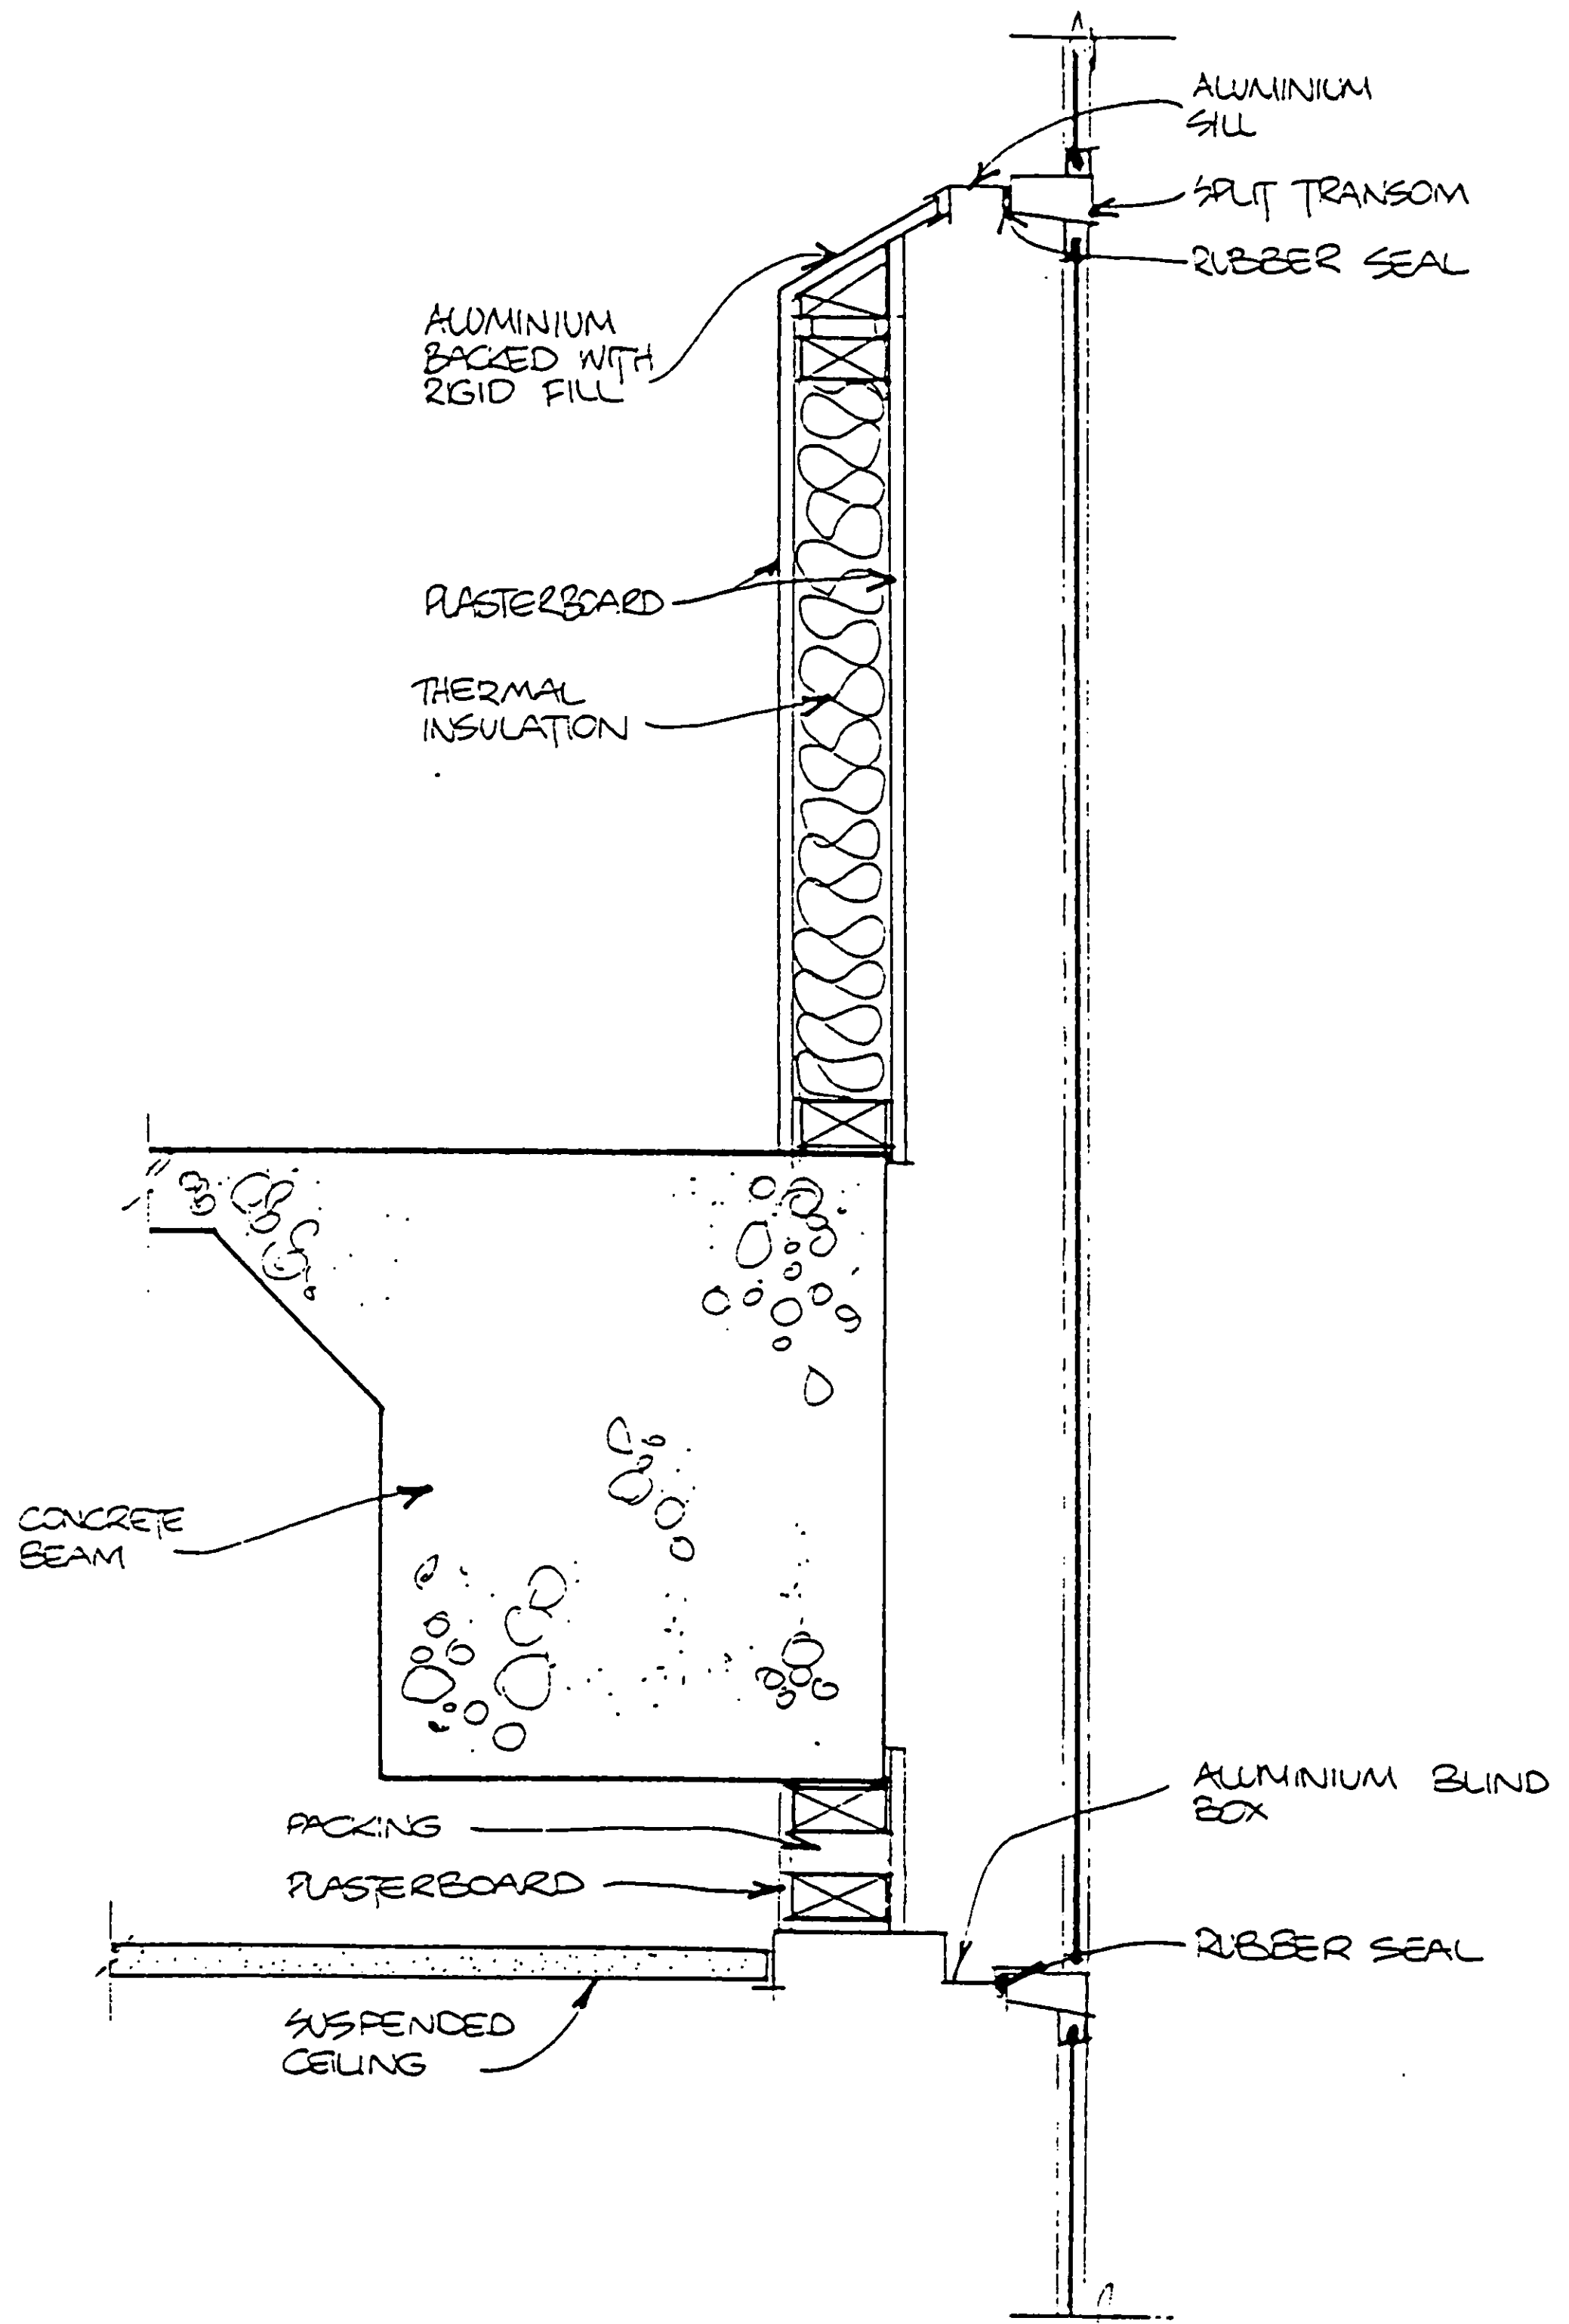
(b): SECTION THROUGH CONCRETE FRAMED, GLASS CURTAIN WALL BUILDING.
